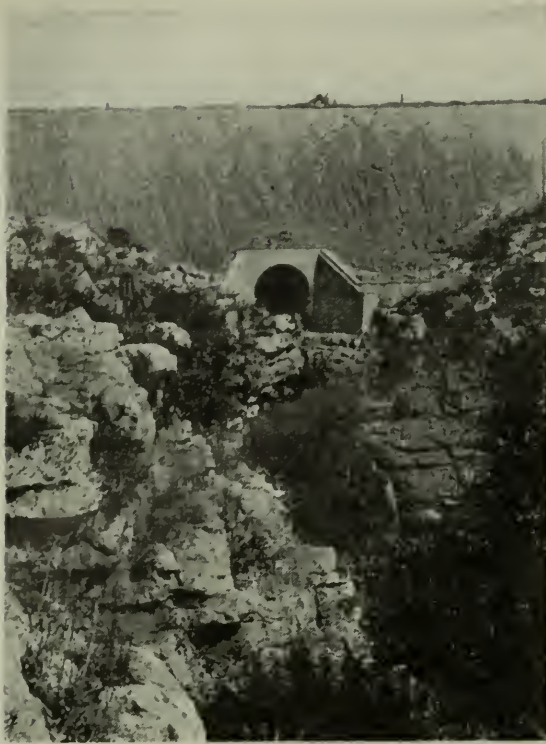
OUTLET OF CATO RIDGE CULVERT.
